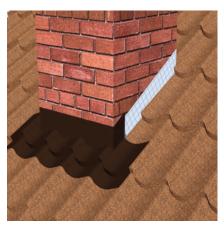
The roofing tape gluing in the lower part of adjoining
